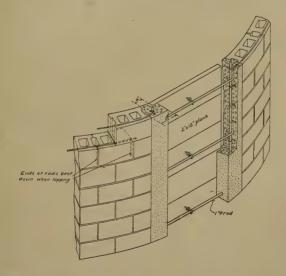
Continuous door opening for concrete block silo. View shows the manner of fastening reinforcing rods to the door frames, also of anchoring rods around a block instead of lapping.
